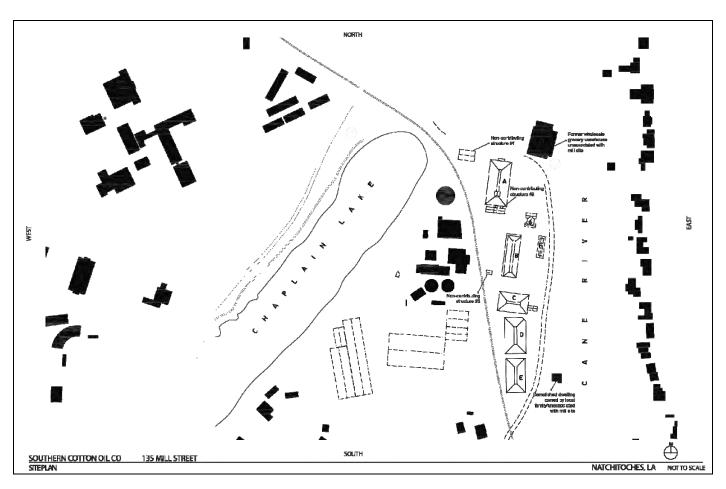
This site plan of the Southern Cotton Oil Mill property shows all seven contributing buildings (A-G) and the locations of the site's 3 non-contributing buildings. Building A - Seed House 1; Building B - Meal and Hull House; Building C - Seed House 2; Building D - Seed House 3; Building E - Seed House 4; Building F -Machine Shop; Building G - Mill Office.
